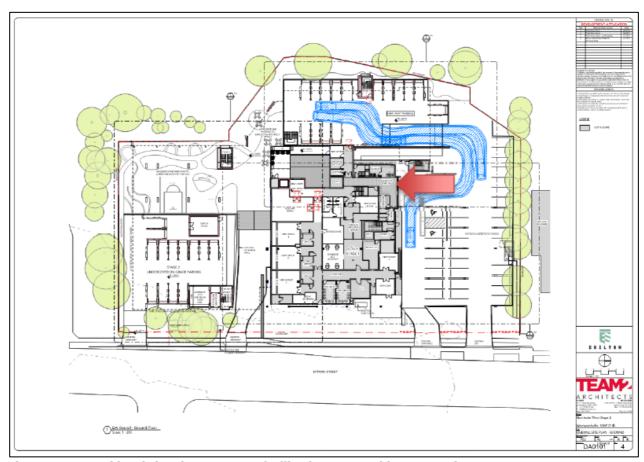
Ground level showing access to facility (Team 2 Architects 2021)
